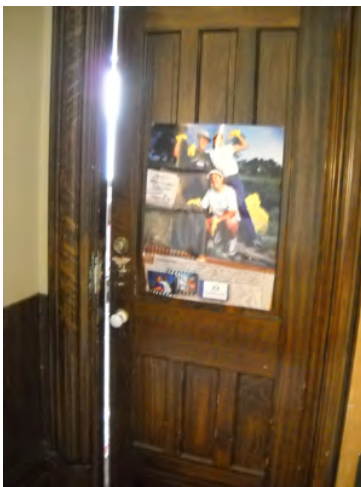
Current view of the door leading to the Northeast Bedroom (now Campfire Girls office). Note the original graining on the door and trim—all the doors on the Bedroom Level would have been treated in this way originally.
